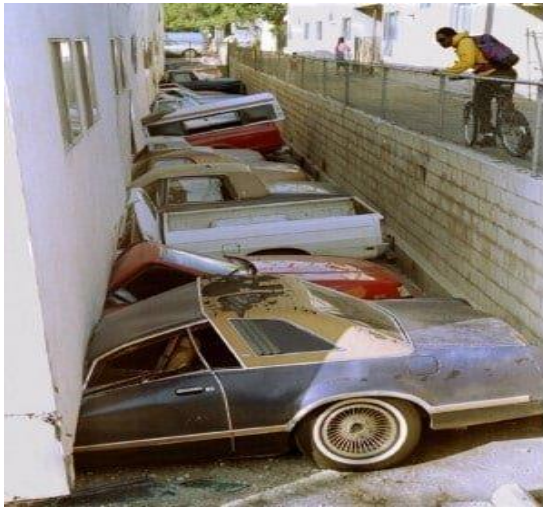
Flexible Ground Floor Of Multi-Storey Structure Which Would Cause Structural Failure During Earthquake Fig: 25: Soft Storey –Flexible Storey Problems During Earthquakes
